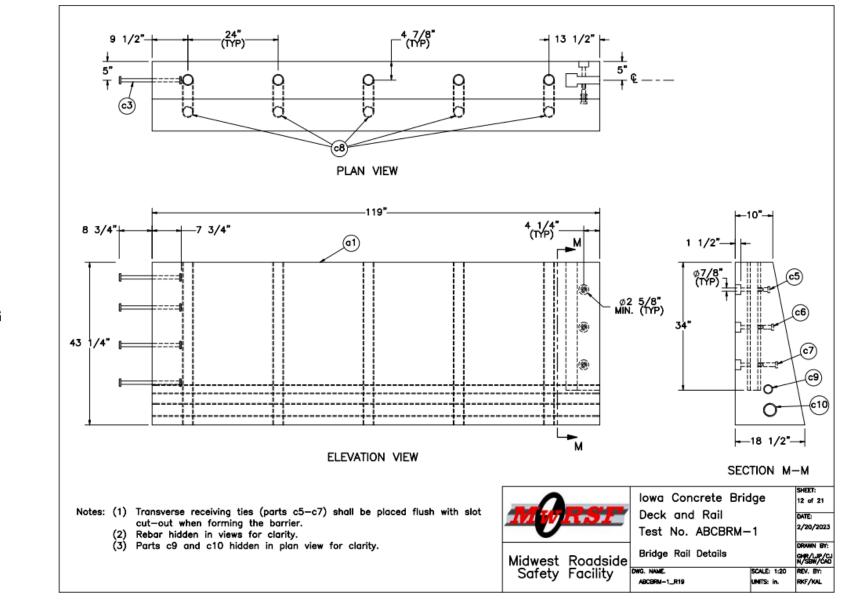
Bridge Rail Details, Cont., Test No. ABCBRM-1
